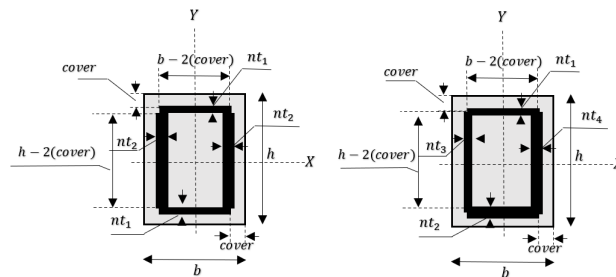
Left-Non-cracked cross-section for symmetrical reinforced columns, Right-Non-cracked cross-section for asymmetrical reinforced columns
